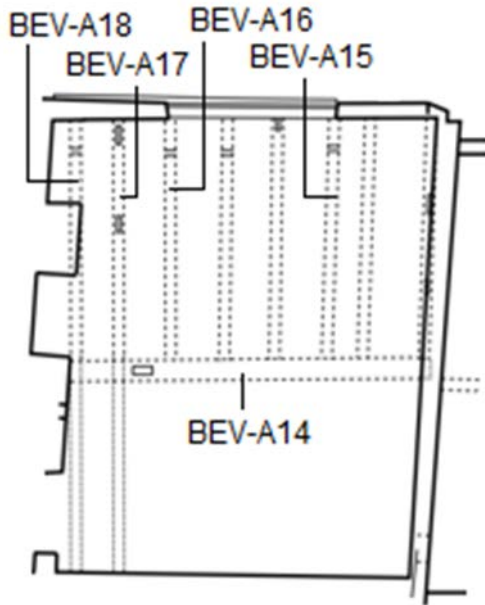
Plan of exposed ceiling beams in 19 Ladygate, showing the location of samples BEV-A14–18 (after YVBSG 2016)
